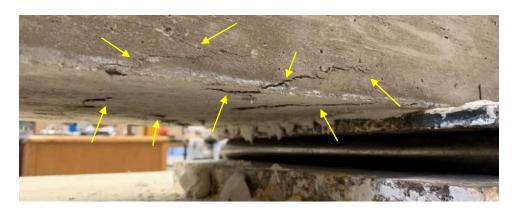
Longitudinal Crack Branching (C3/60-50-5-200)
